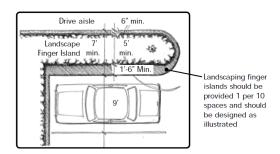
Landscape islands shall be provided 1 per every 10 parking spaces.
